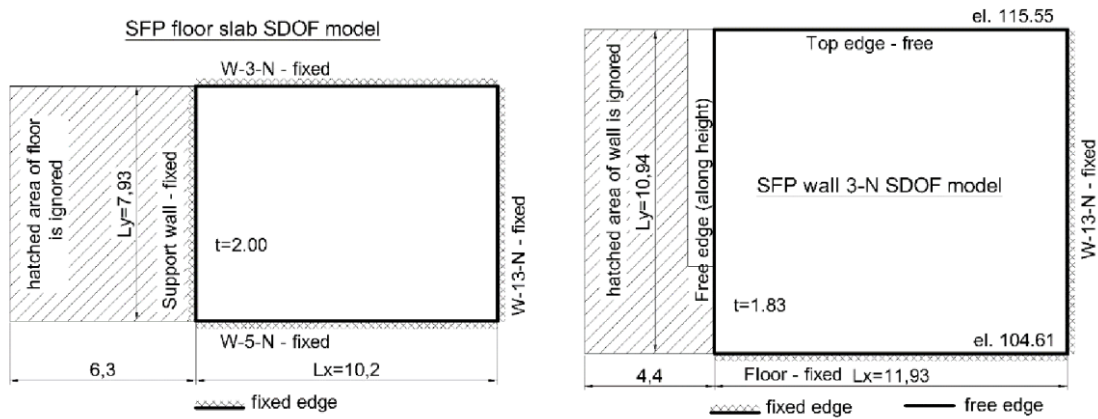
SDOF models for structural evaluation – floor slab (left); critical wall (right)
